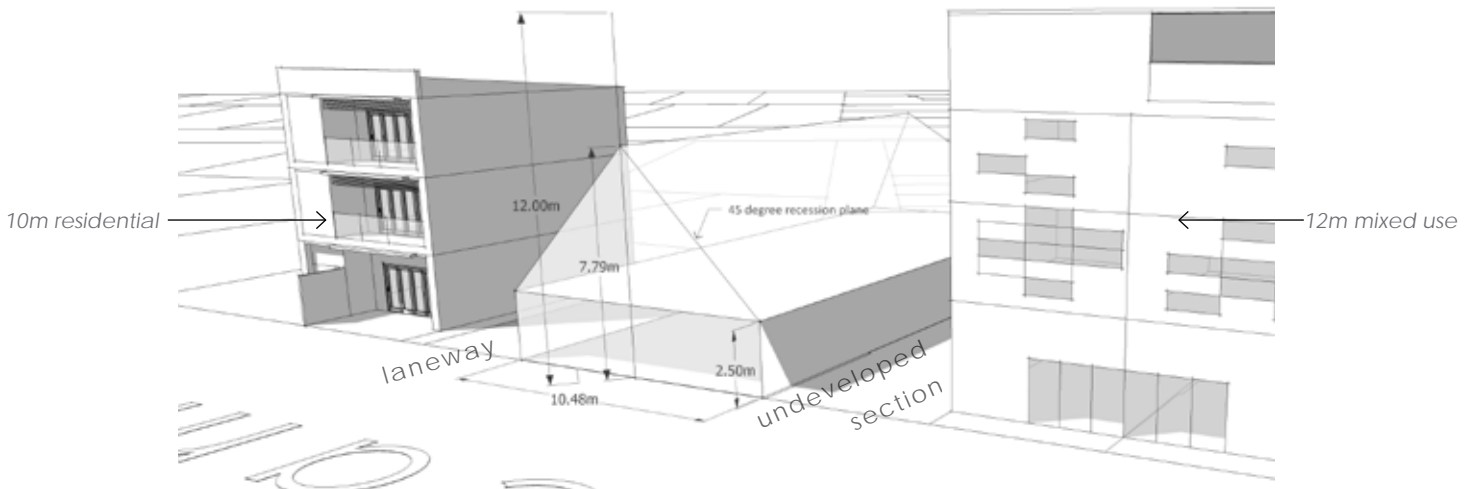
EXISTING RECESSION PLANES WITH THE REMOVAL OF THE STREET FRONTAGE RECESSION PLANE
